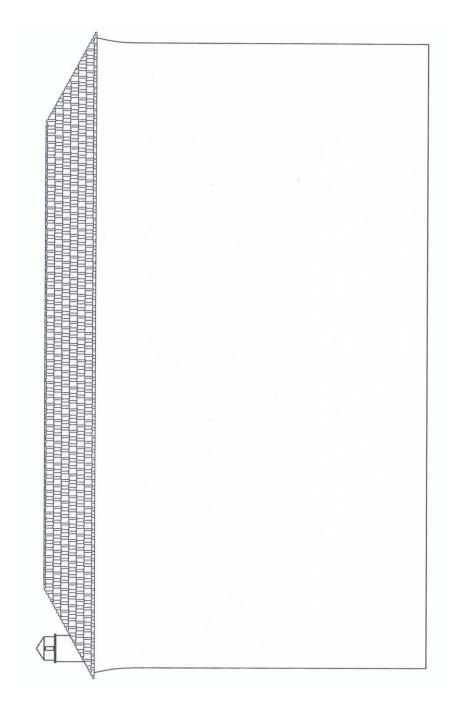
Rear Elevation of 19-Hamam Street Scale: 1/75
